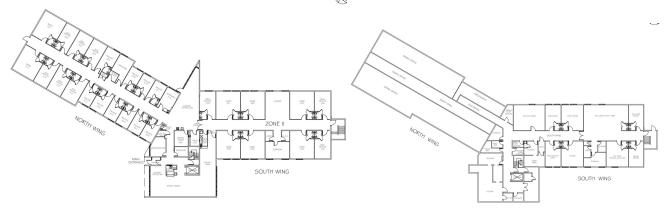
Existing Floor Plans of Former Stone Ridge Care Home
